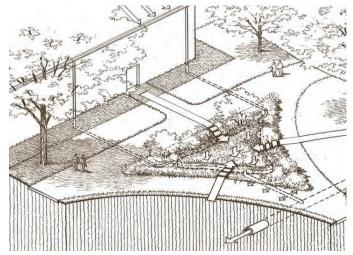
Illustration of a typical rain garden designed to capture runoff from adjacent buildings and paved areas.
